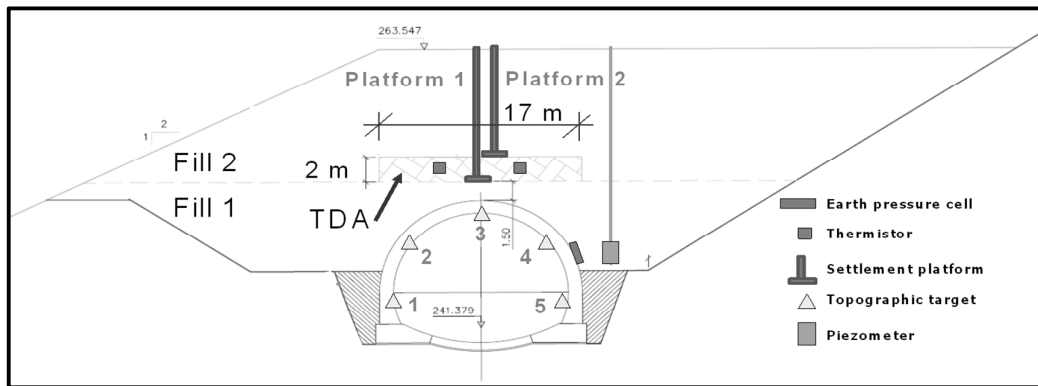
Instrument layout at monitoring sections S1, S2 and S3.
